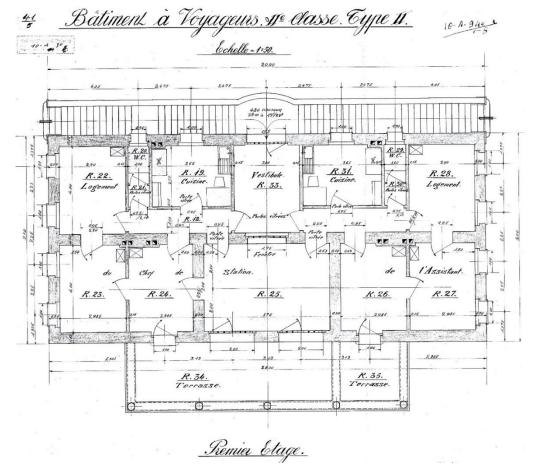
II^{nd} Class / Type II project / First floor plan
